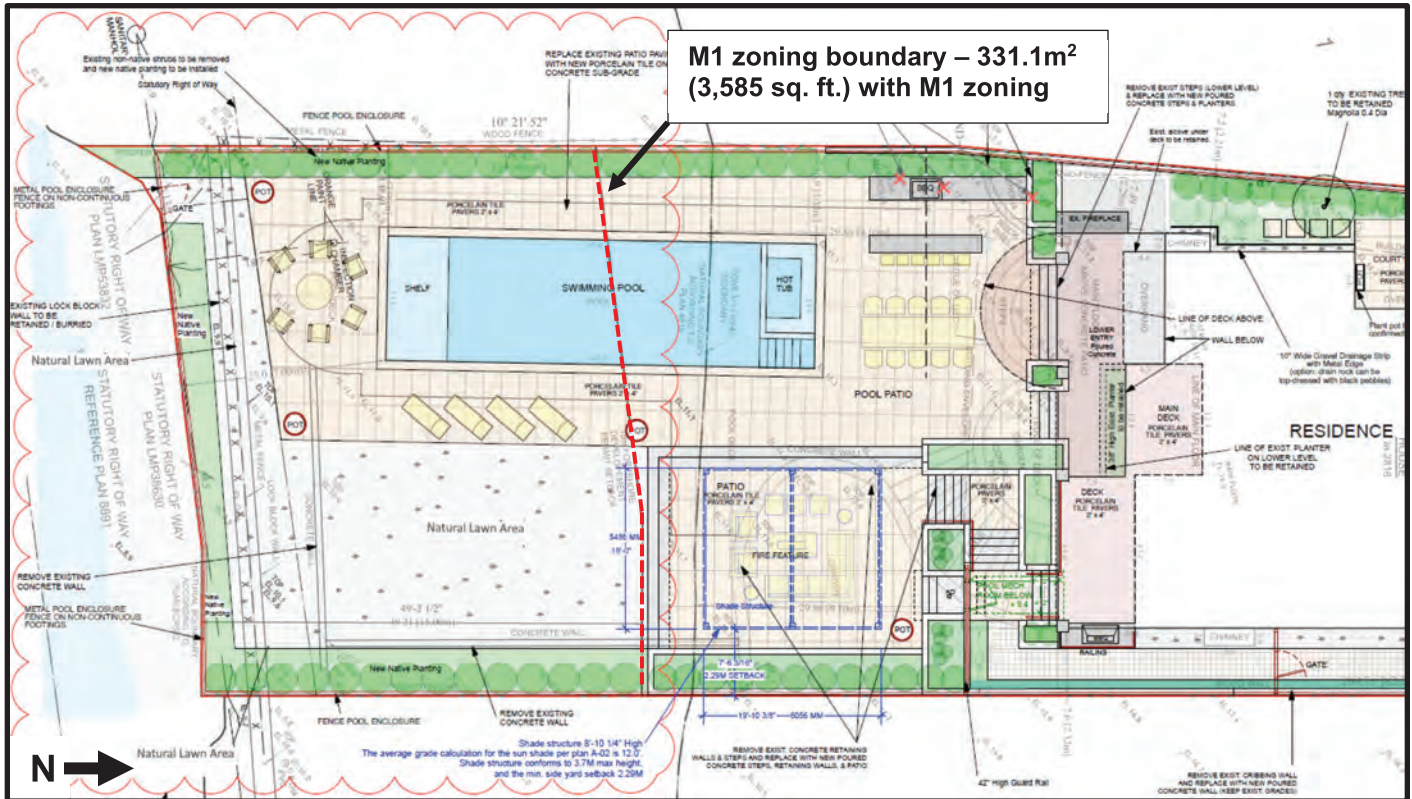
Excerpt of landscape plan (showing southern portion of site)
